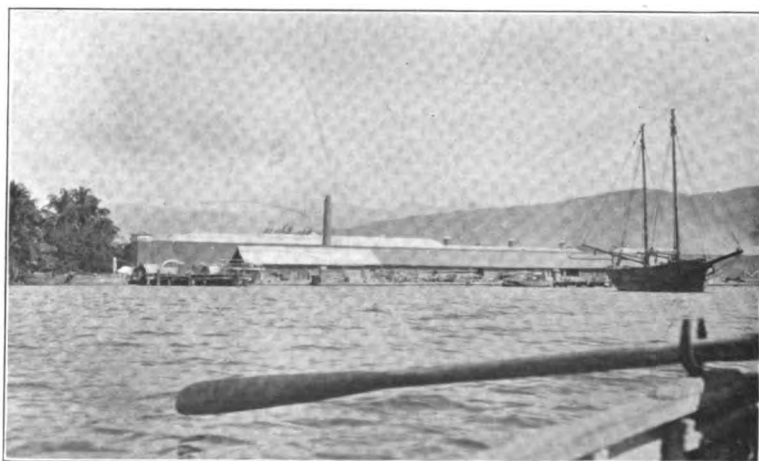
LOOKING NORTH TO LANDING PLACE AT GENERAL PENITENTIARY. Massive walls cracked; a section of the eastern wall was demolished. Upper part of chimney overthrown to east.
